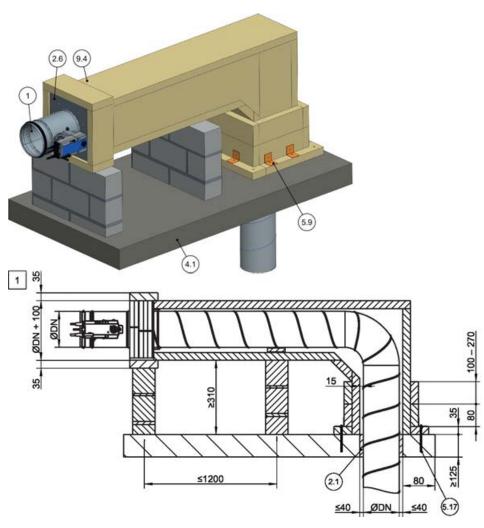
Dry mortarless installation remote from solid ceiling slabs, with installation kit WE2
